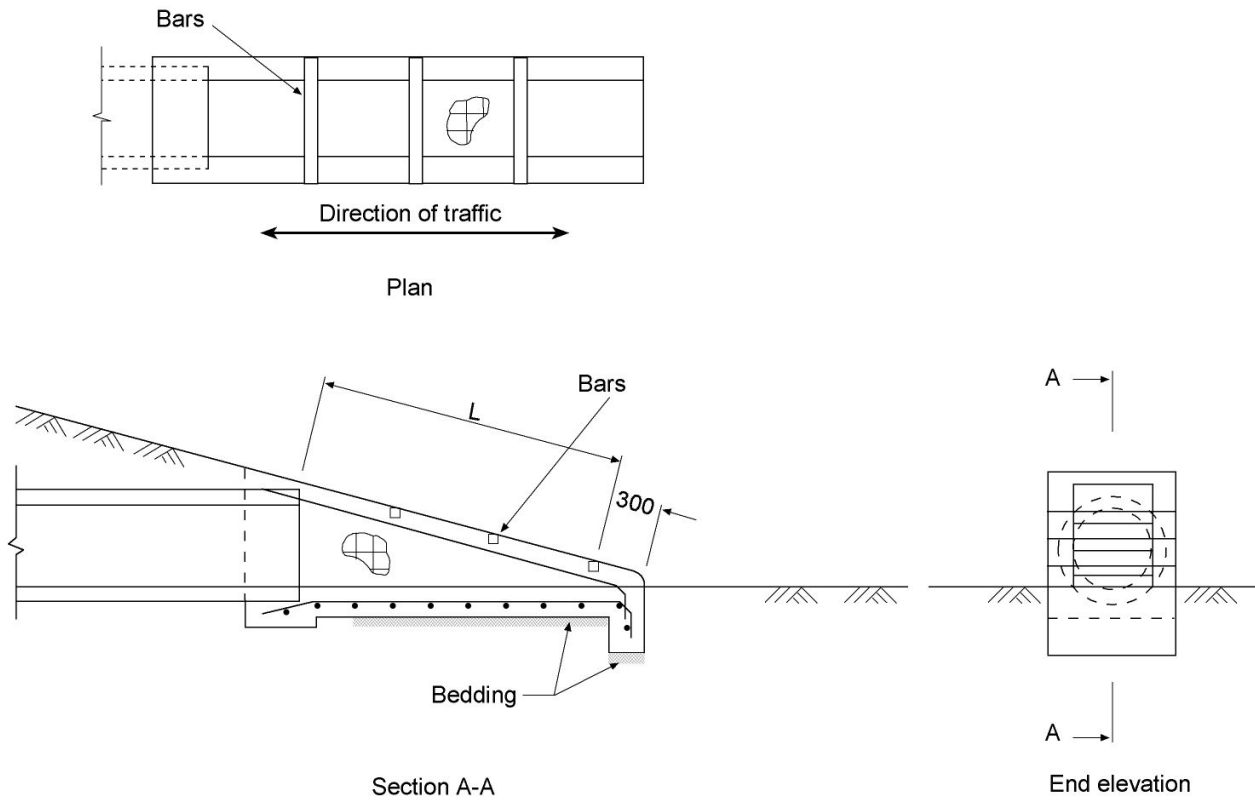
Example of a traversable culvert end treatment for a culvert under the road
